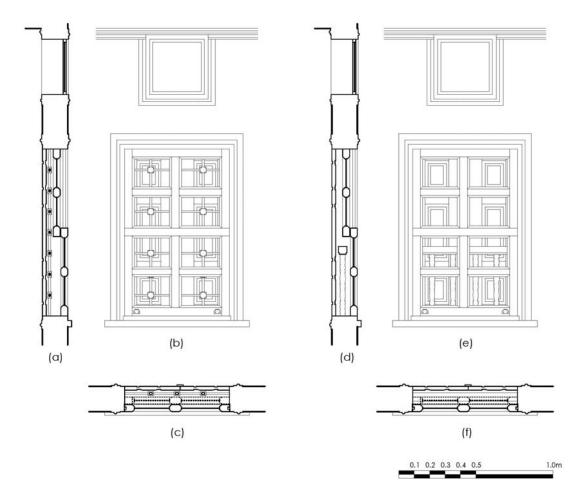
The rectangular window section with full rain (a), view (b), plan (c); the rectangular window section of half-rain (d), view (e), plan (f).
